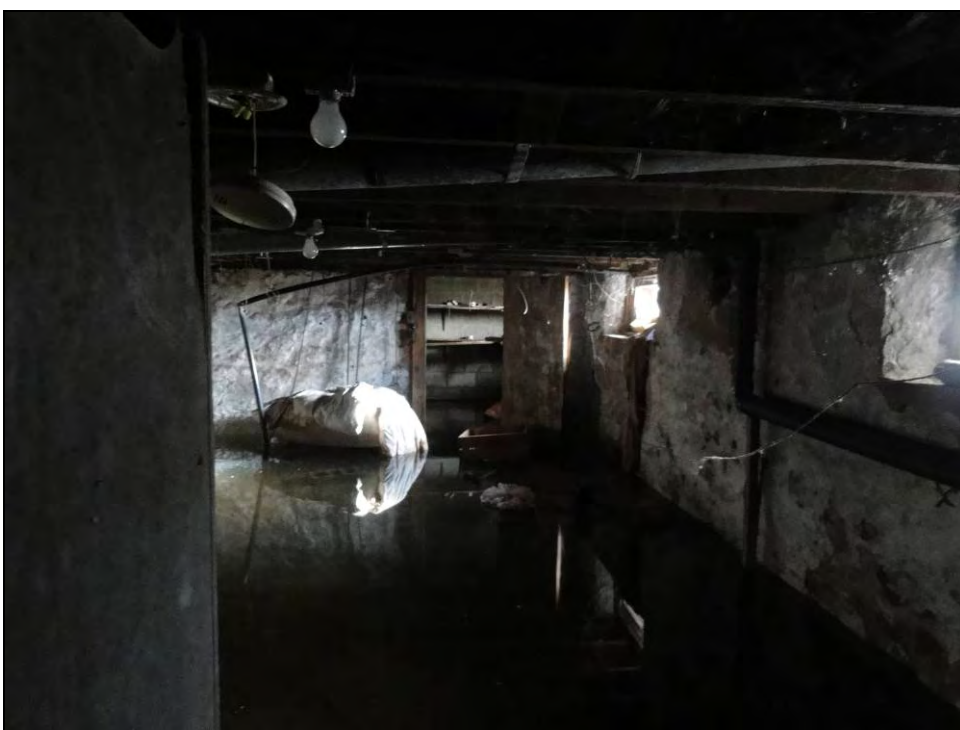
View of basement from the stairs, looking east. Note the entrance at the far wall into a cold cellar under the front porch.
